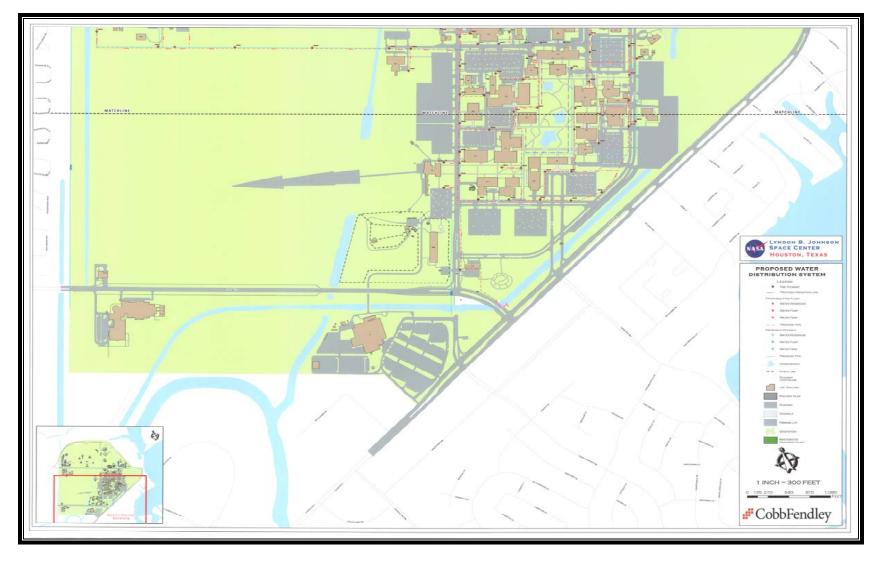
Proposed Project (Water Lines on southern section of JSC, including connection to Space Center Houston)
